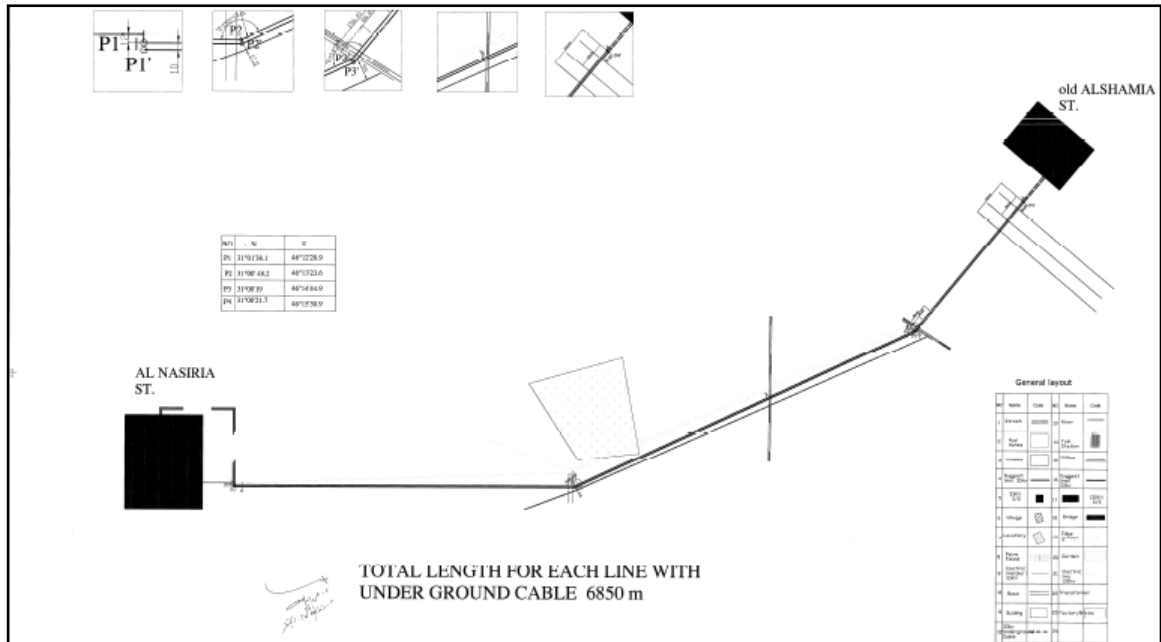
33-kV power line drawing (Courtesy of the USACE)
